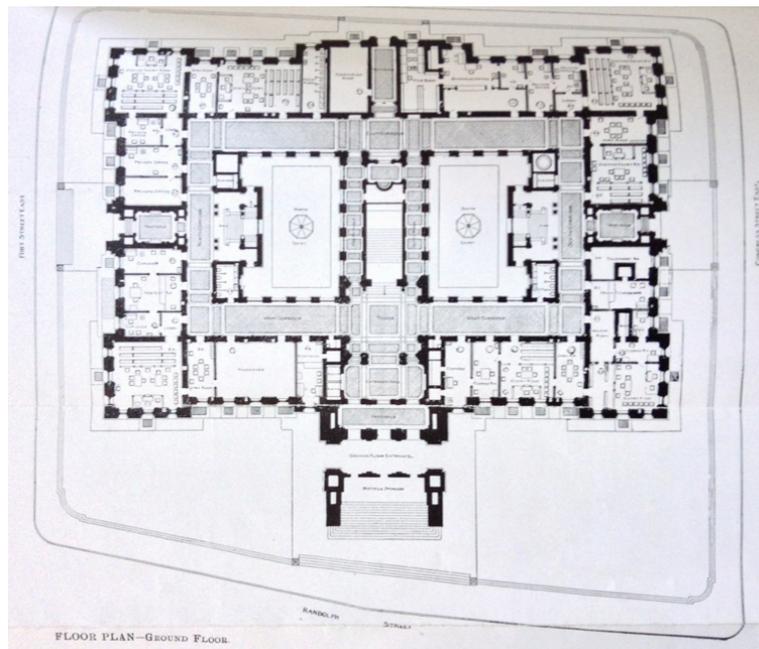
Wayne County Courthouse Ground Floor Plan. ↖ NORTH
